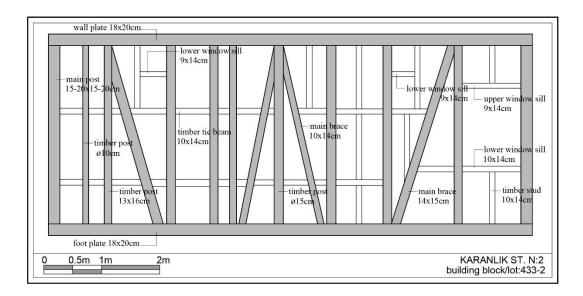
Drawing of timber framed wall of a house surveyed (Cumhuriyet N. b.block-lot: 433-2)
